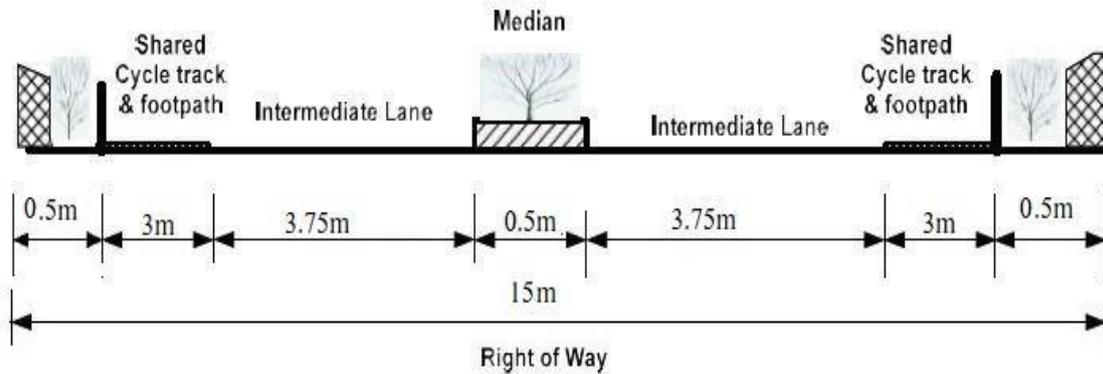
Typical Cross-section for Class A Roads (with RoW 15 m)
